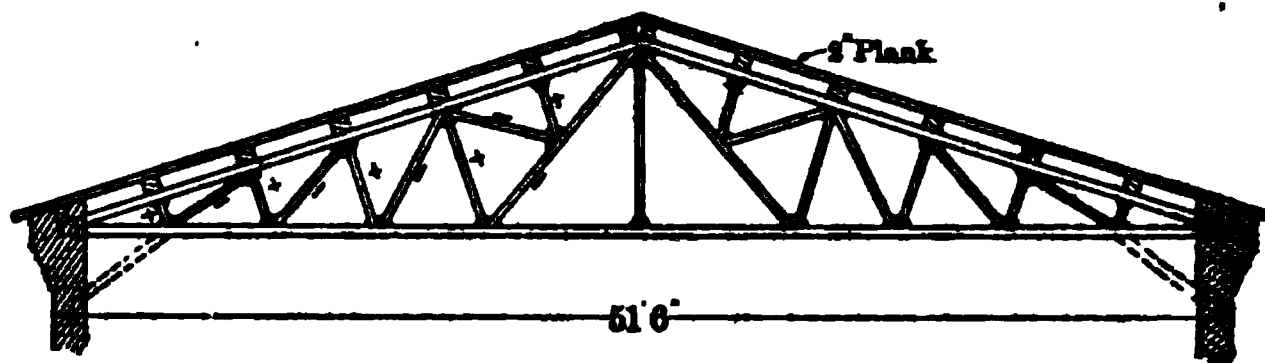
Fink Truss. Span Fifty-one Feet Six Inches
